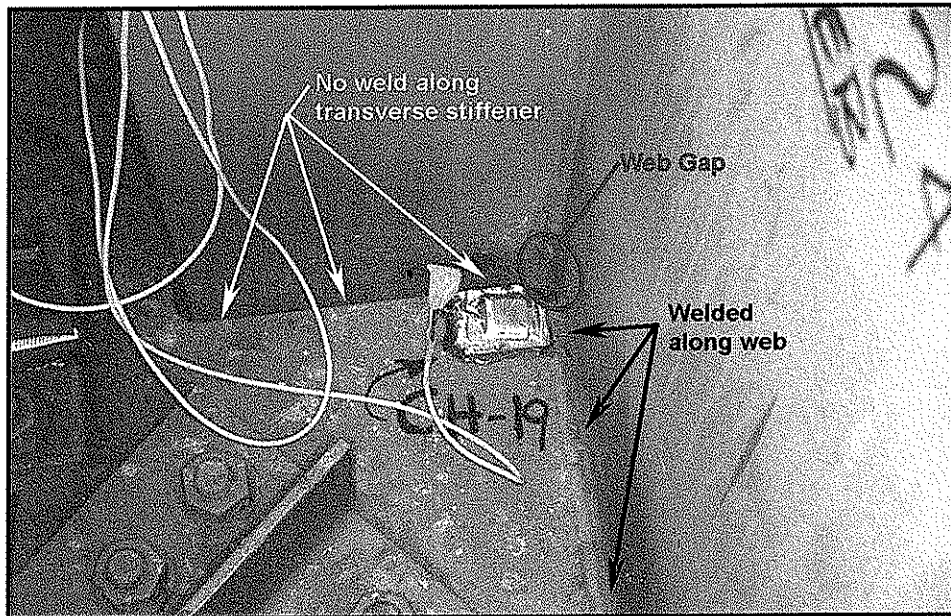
Photographs showing a detail in which the gusset plate is attached to the web but not the gusset plate. Note the location where web gap cracking typically occurs.
